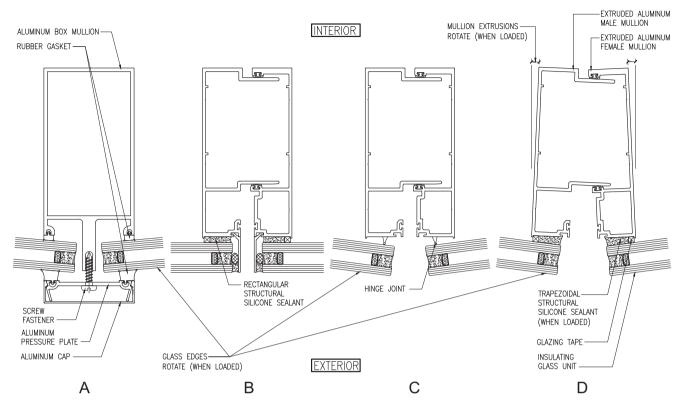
Cross-sectional shapes of vertical mullions. In detail "A", glass is held mechanically to a simple box section. Structural sealant, in detail "B", bonds glass to the male and female profiles of a unitized wall's split mullion: this design's structural idealization is shown in "C", although "D" may be a better represent the wall's actual behaviour when subjected to wind load.
